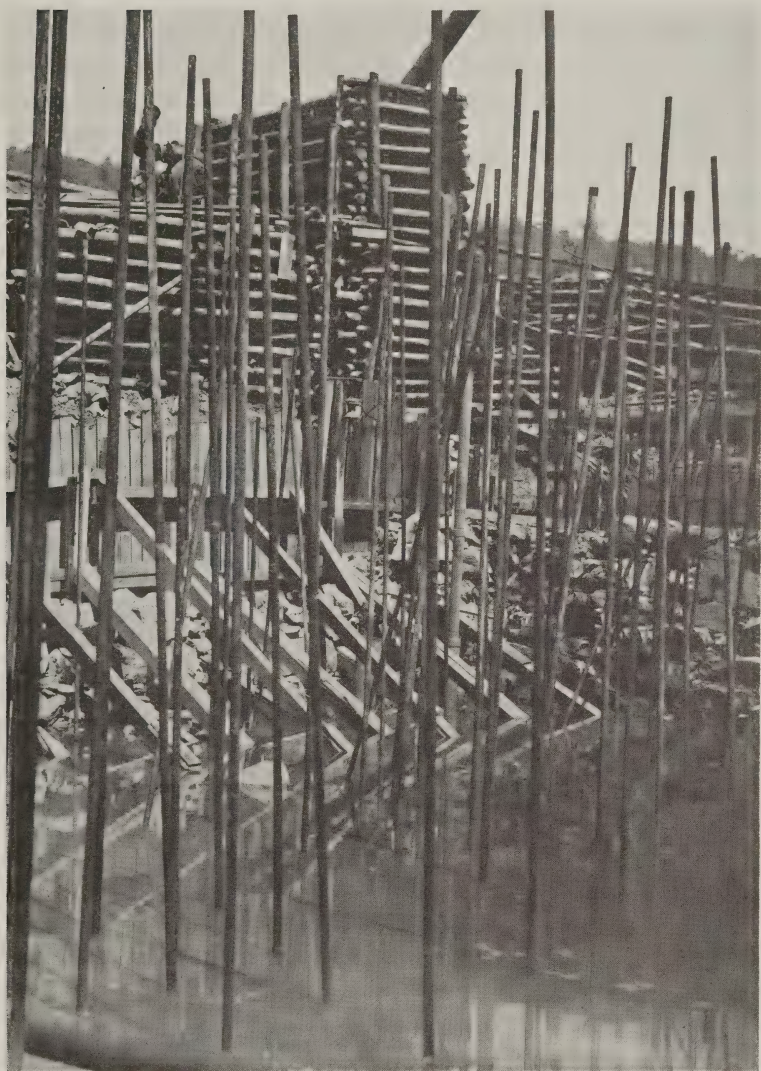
Second dam section at Hales Bar, piped and ready to "flood" before grouting; the pipes extend a few feet above the water surface outside of the pit. This method was used where the bottom was not "tight" enough to hold the grout. The holes were drilled in the dry.
